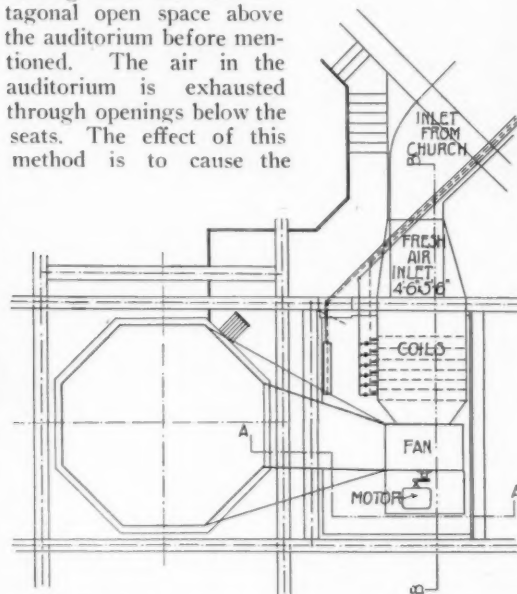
Plan of ventilating apparatus located in attic over the auditorium.
